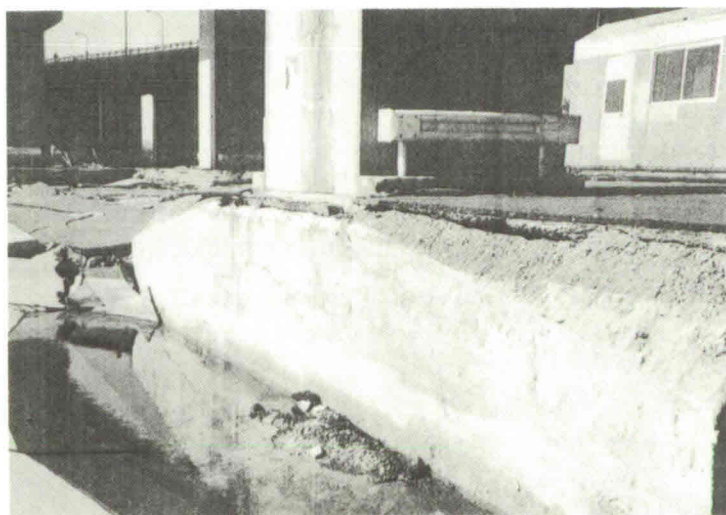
Foundation of elevated approach span connecting to the Second Maya Bridge
